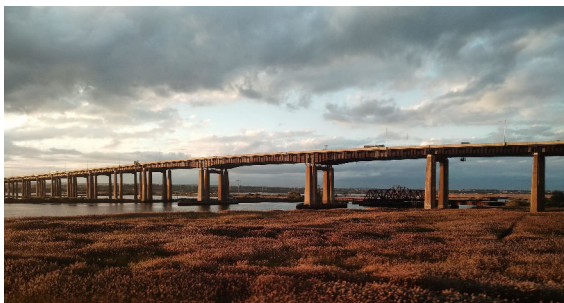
Beam structure. I-95 near DB Drawbridge, Secaucus, NJ.
